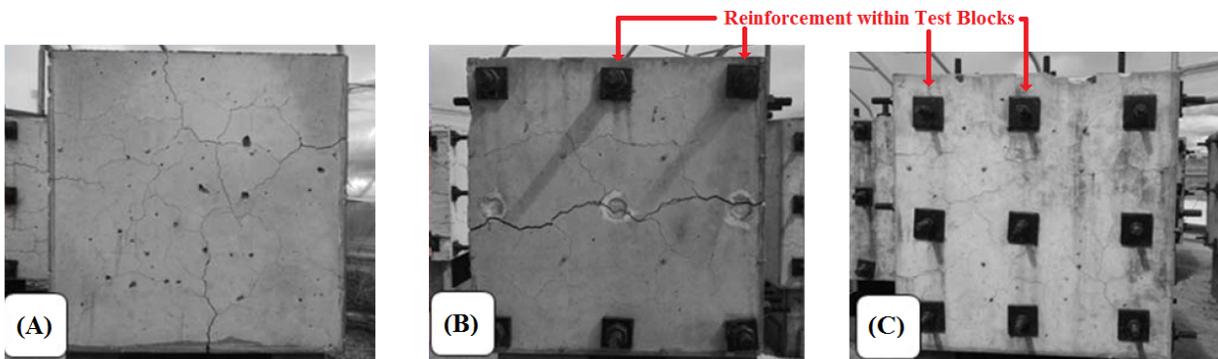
Photographs from Allford Study (A) Unreinforced specimen; (B) Specimen with Bidirectional Reinforcement; (C) Specimen with Reinforcement in All Three Directions
